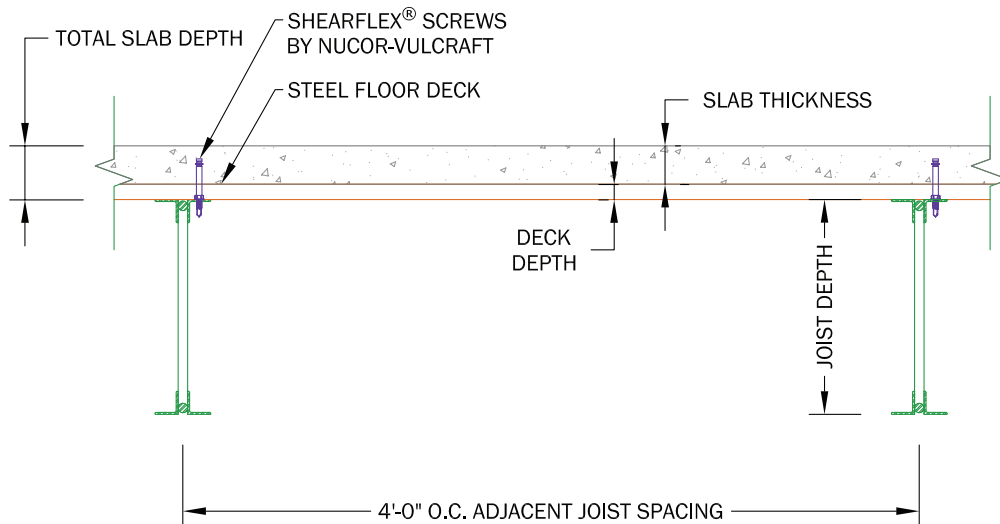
Joist Spacing, Joist Depth and Slab Thickness Detail
